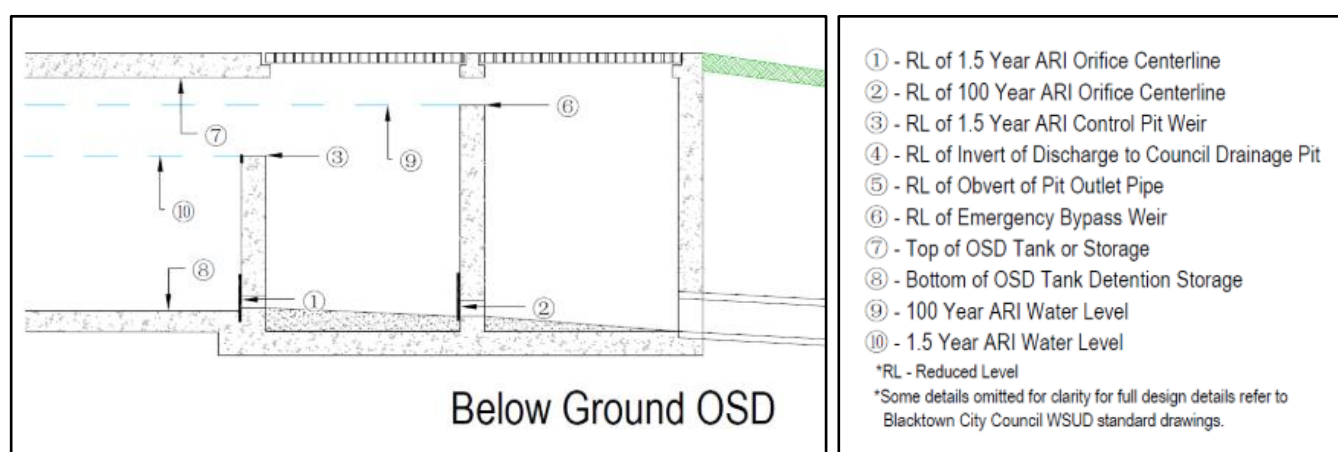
Typical Section – Below Ground OSD, Source: S3QM
